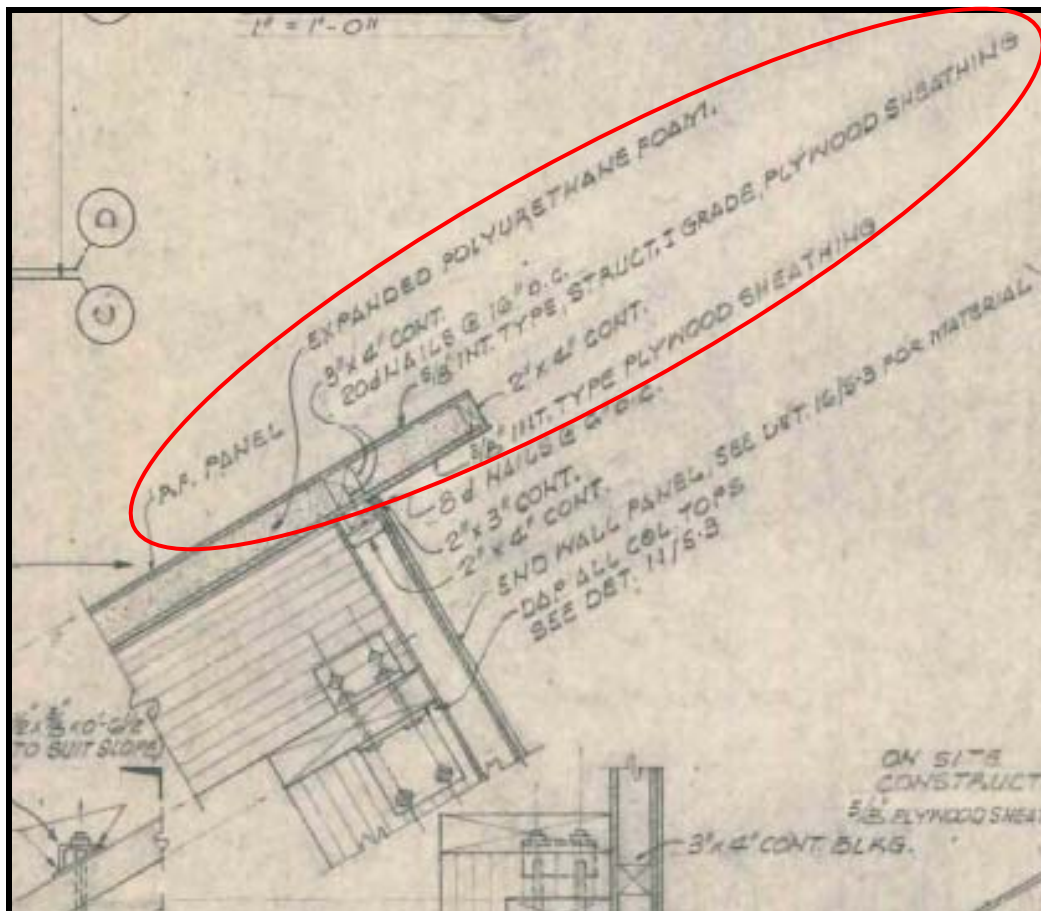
Detail 3 on Sheet S3 of the Structural Plans
